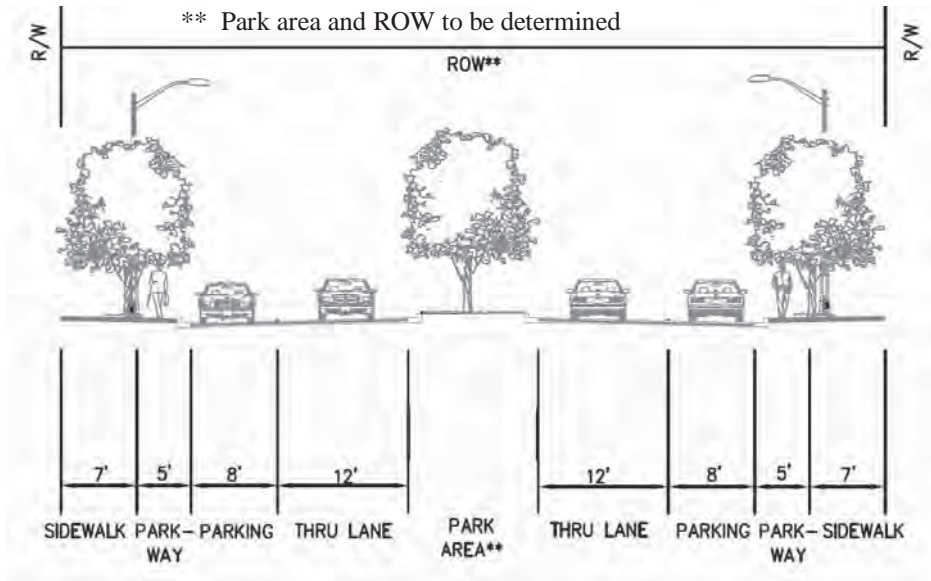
Proposed Cross Section, Entire Length of Woodlawn Avenue
